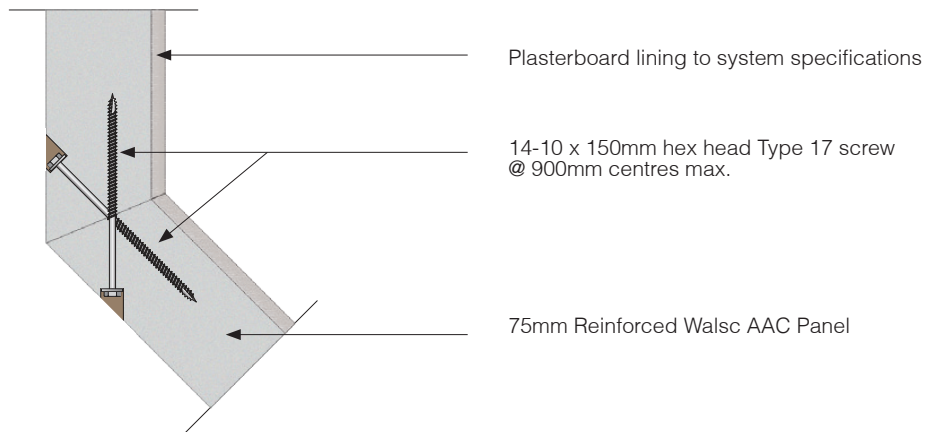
Service Shaft Wall Option 1 Mitred Fixed Joint Detail
